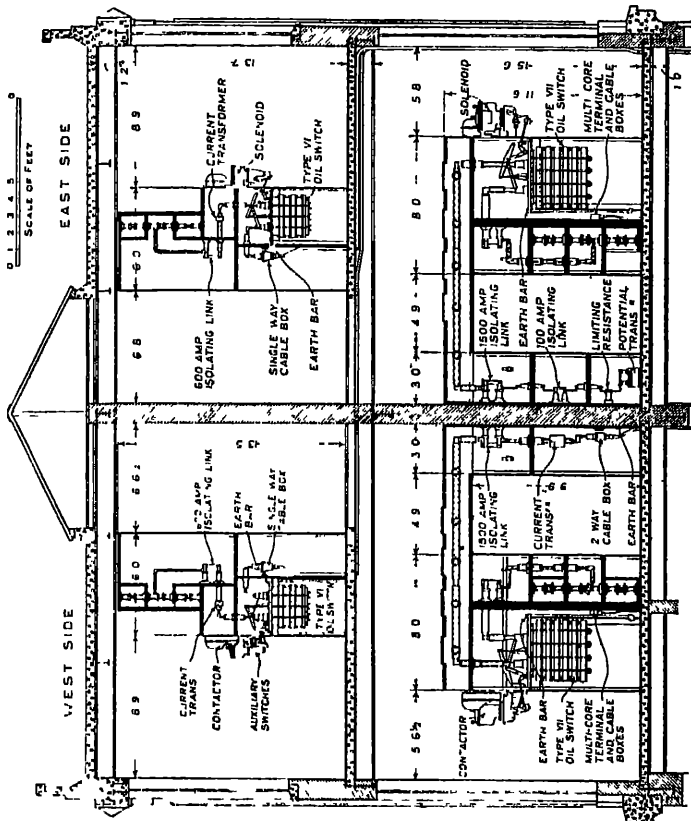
CROSS SECTION OF CUBICLE SWITCHGEAR AT PRINCE'S POWER HOUSE, NEECHELLS,
